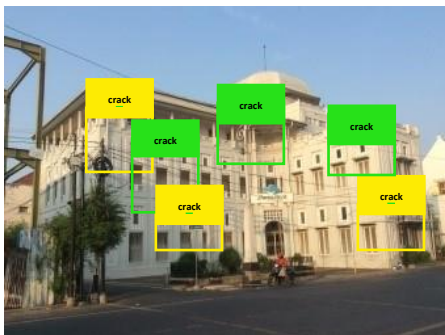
shows Jiwasurya building with a white plaster façade and repetitive window modules.
